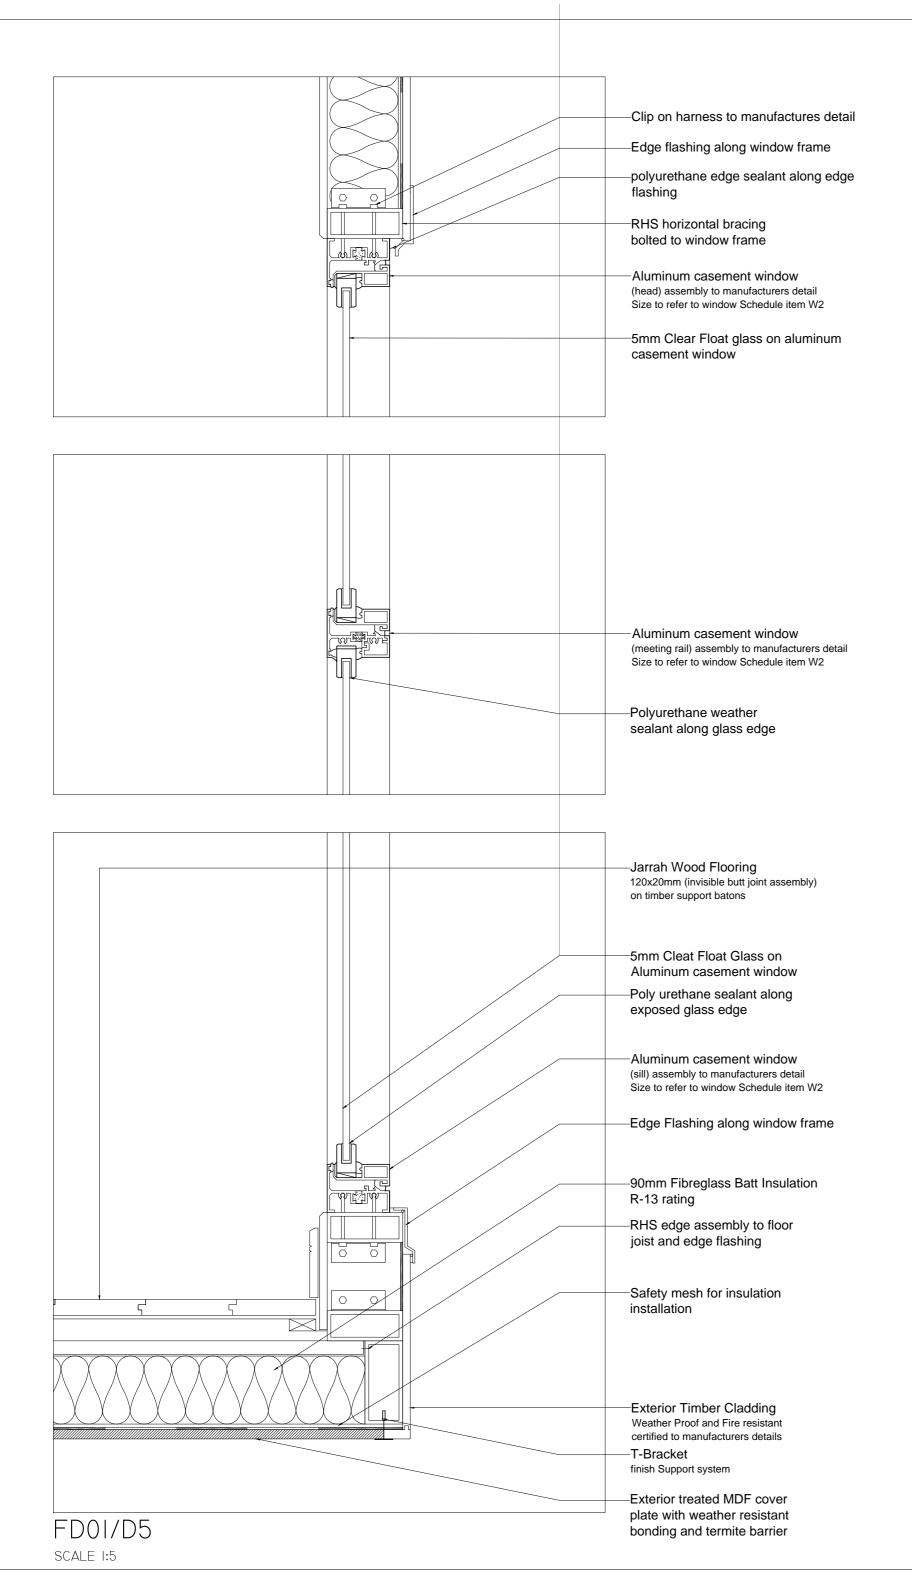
DETAILS TO INDICATE CONSTRUCTION SYSTEM
